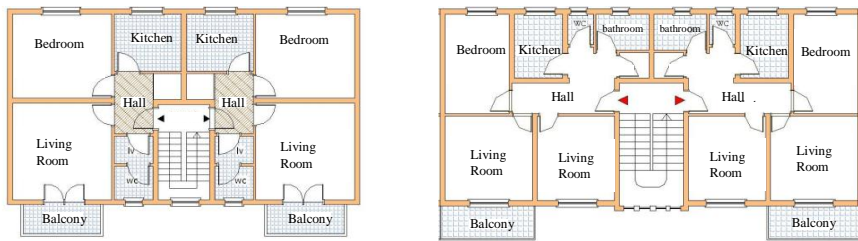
Sumerbank Outer Duty Lodging Building Plan and Sahabiye Municipality Lodging Building B Type Building Plan (Özdin, 2009)
